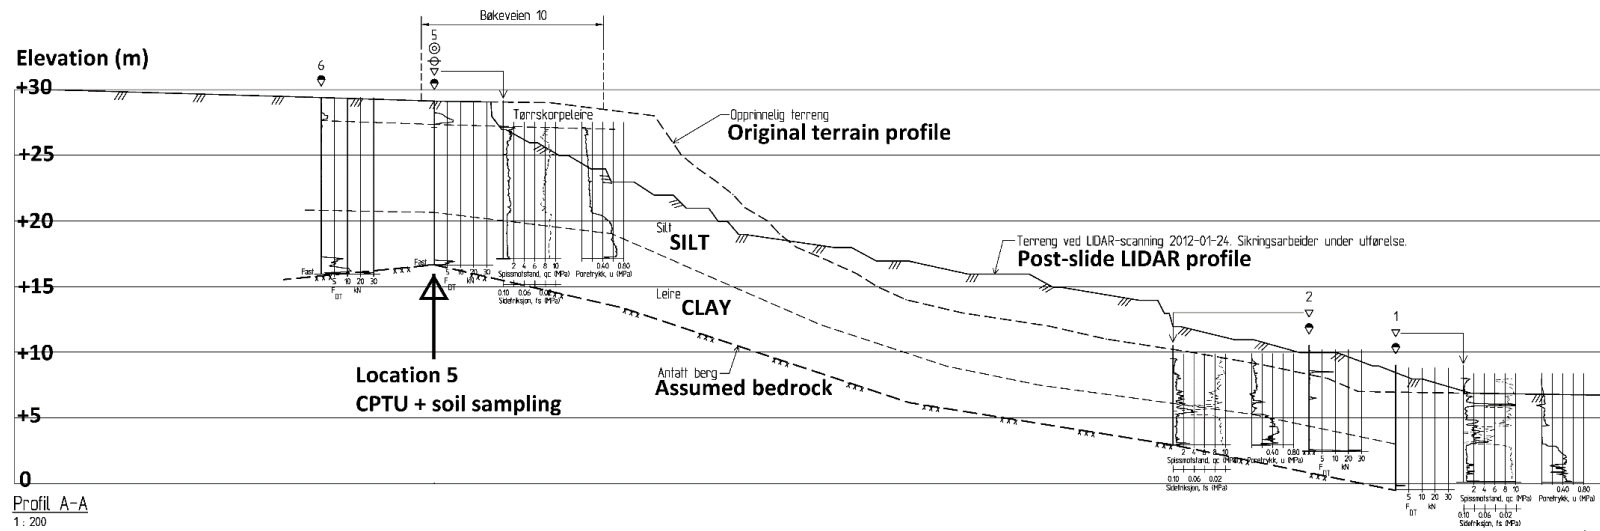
Cross-section showing original slope and post-failure slope profiles from North-West.
